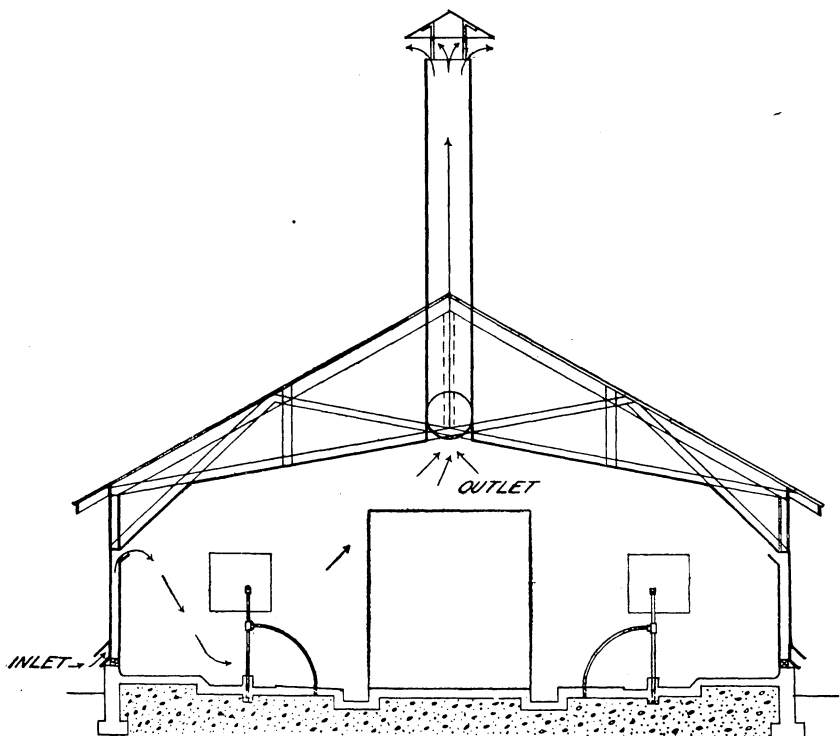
Cross section of one-story cow stable, showing ventilating flues.
